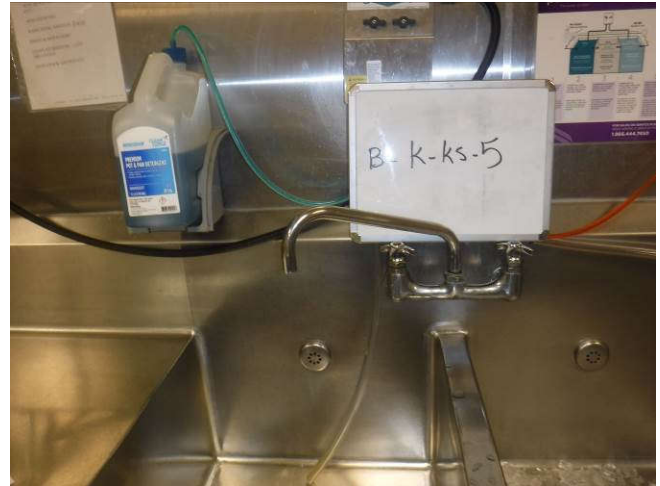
kitchen faucet, located in basement in kitchen at Dish washing station (left fixture)
